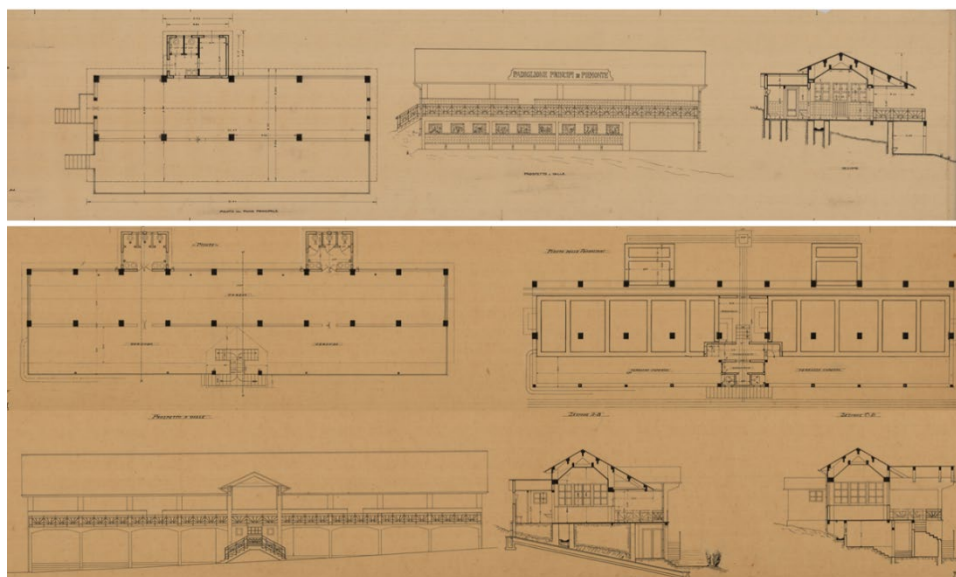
Type 2 used for the construction of Princes of Piedmont and the Sandro Mussolini Pavilions
